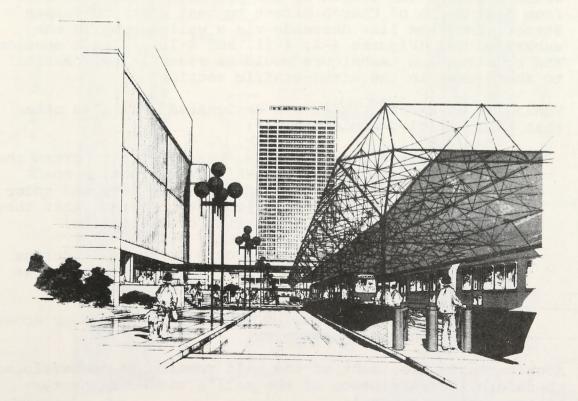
Top: View Looking North on Main Street at Site of Auditorium Station.
